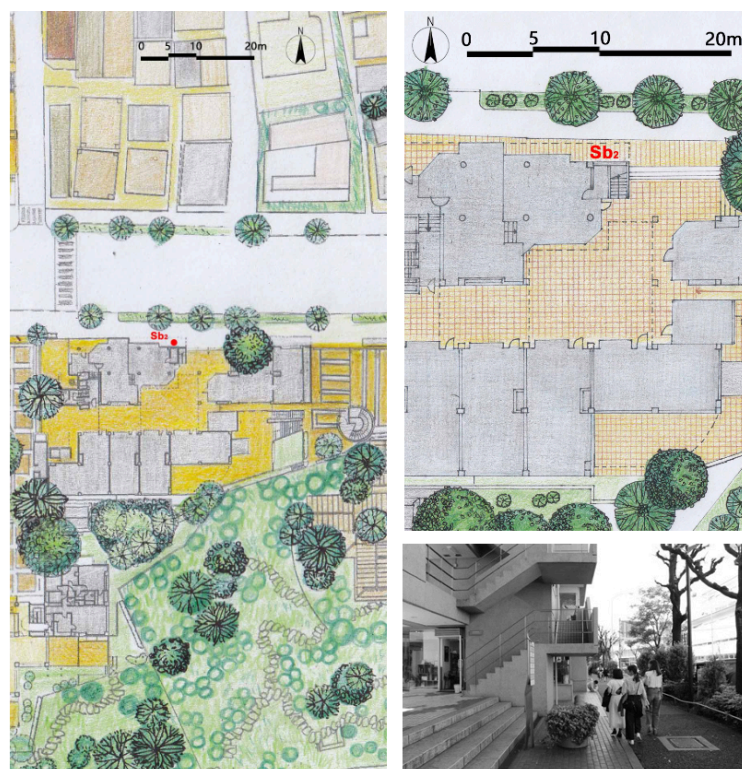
The setback open space (Sb) in Building C. (Source from: drawing and photo from the author)
